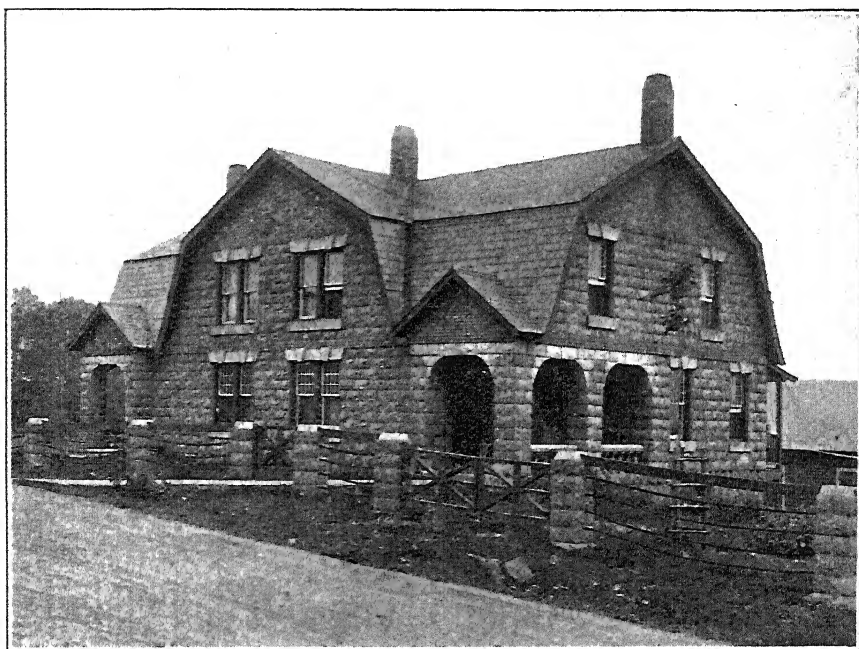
DOUBLE HOUSE OF CONCRETE BLOCKS AT MINEVILLE.
